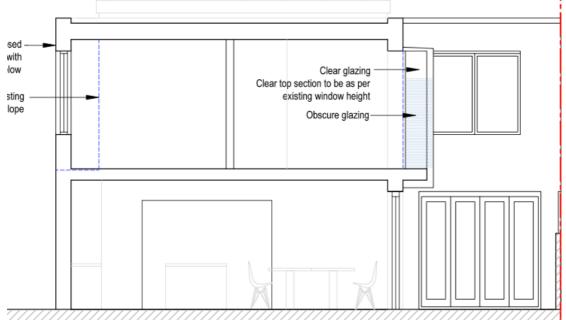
Proposed section showing rear box window and height of obscure glazing element.
